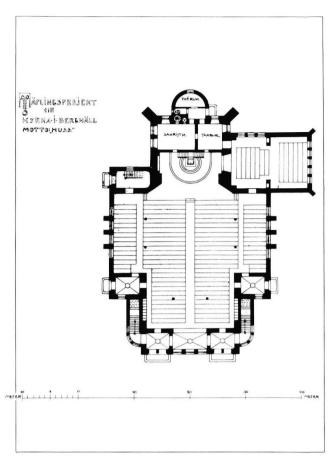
The "Huss" entry, floor plan. (Original and photo SRM).
